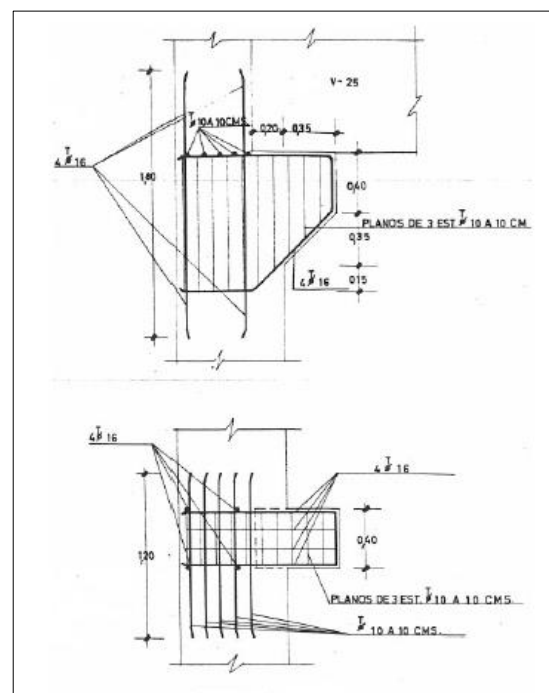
Second Basement Corbel where beam V25 rests on. Source: (SIGMA & Servicios de Ingeniería, 2016)
